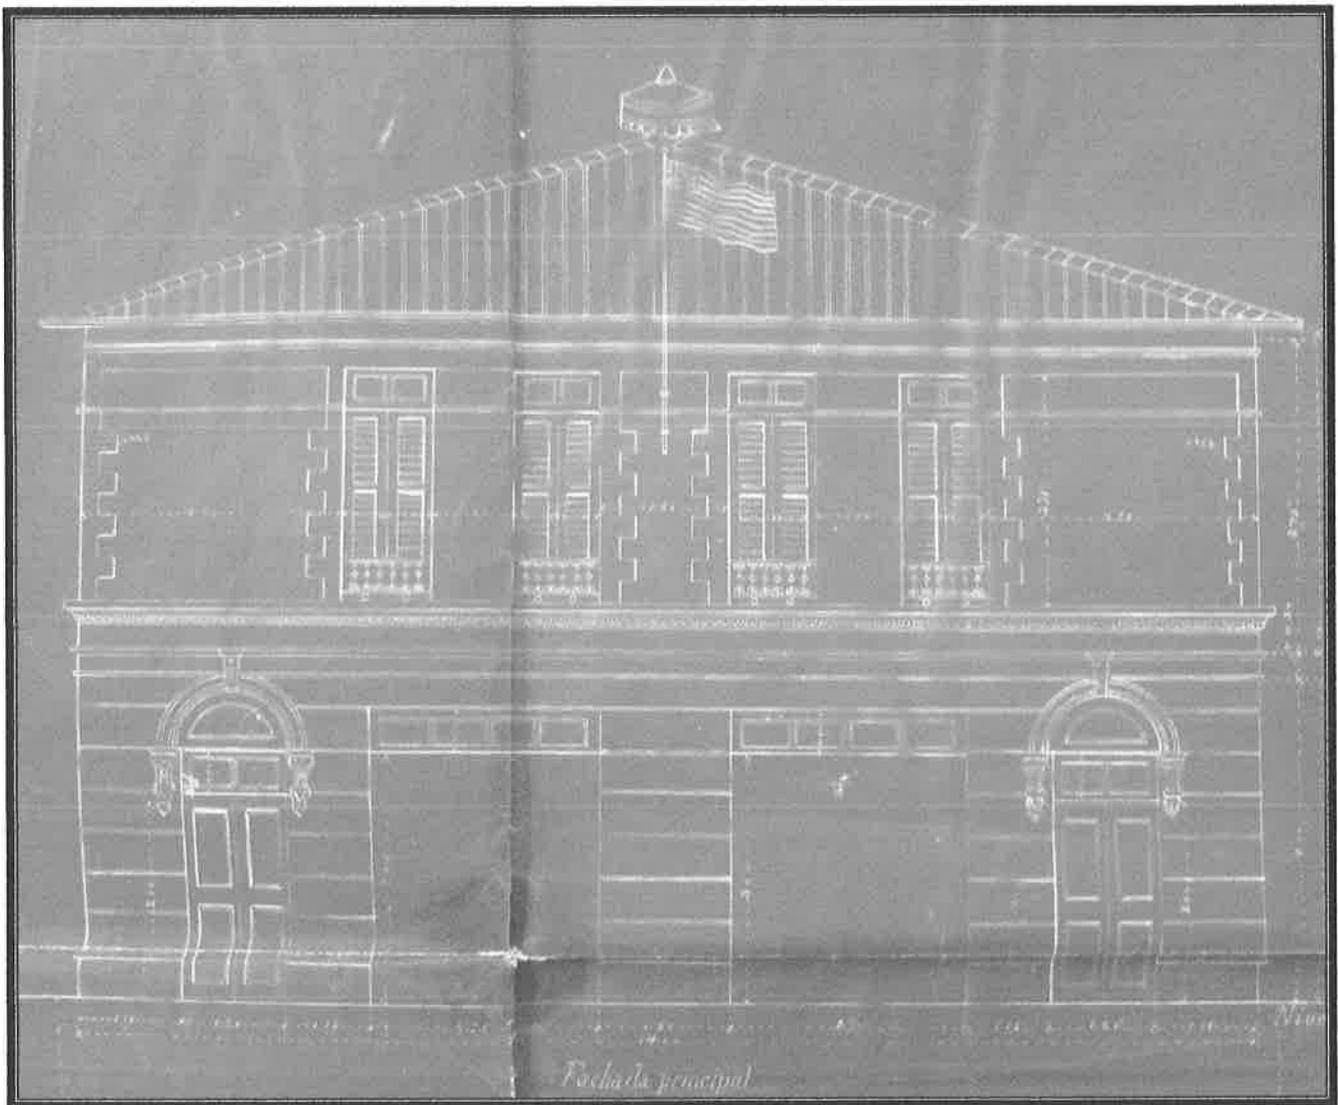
Detail of Manuel Domenech 1903 plan; main façade facing Alfonso XII Street.
